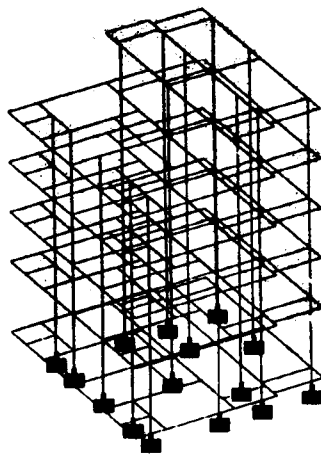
(b) Reinforcement detailing in structural members of a typical residential building (G+4) in Ahmedabad
